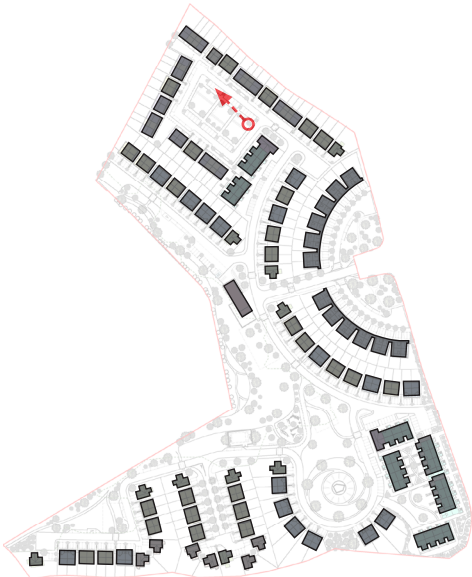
View of Homezone 1 looking north west (soft landscaping not shown for clarity)
